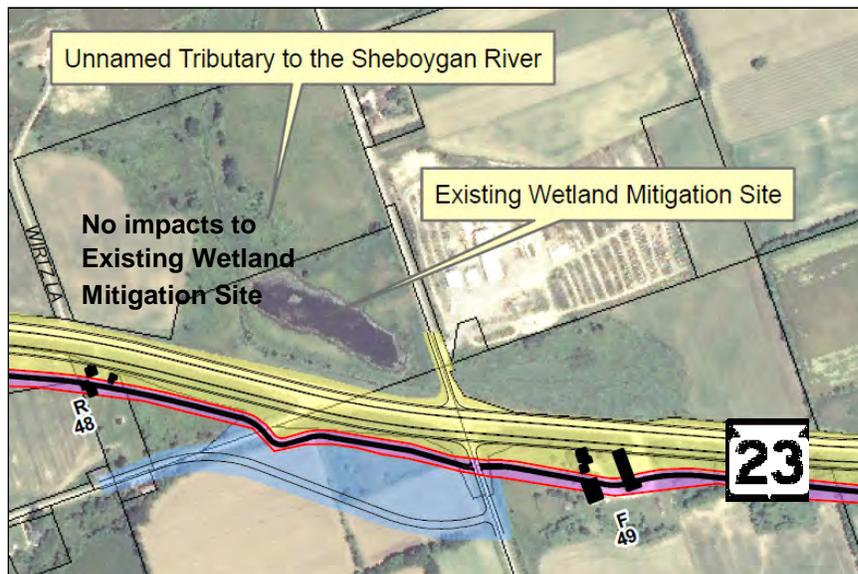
B-8.3 Pit Road Wetland Mitigation Site
